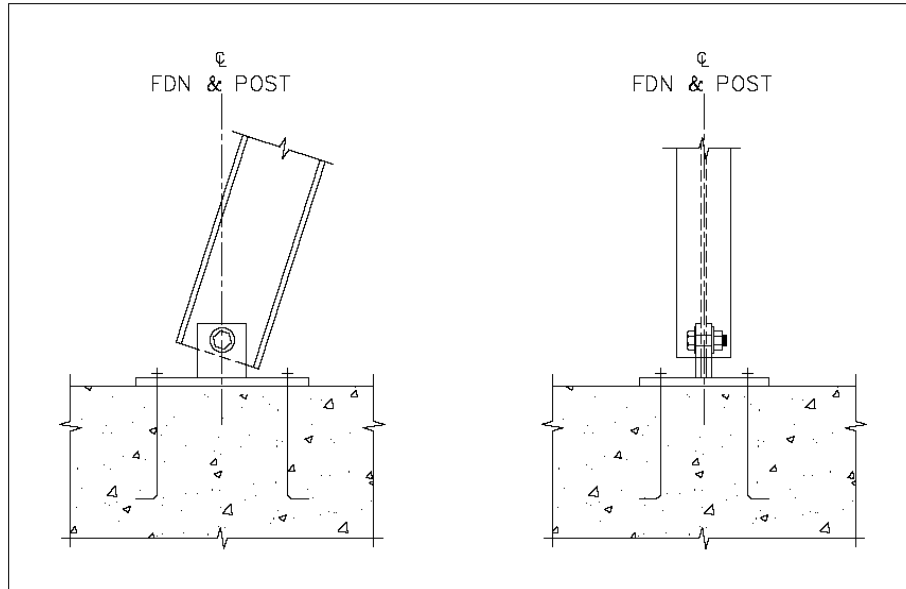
Side and front elevation views of typical pinned post to foundation connection
